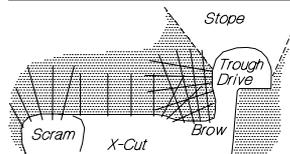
Drawpoint support (modified after Stillborg, 1986)
